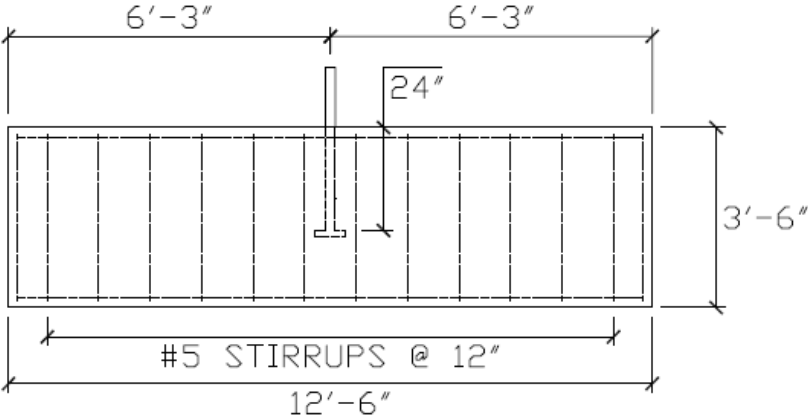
Elevation view of Specimen 2 (Specimens 1, 3 to 7, 10, and 11 had the same design except for the bar embedment length and that the four sets of stirrups closest to the headed bar in Specimen 5 were No. 4)
